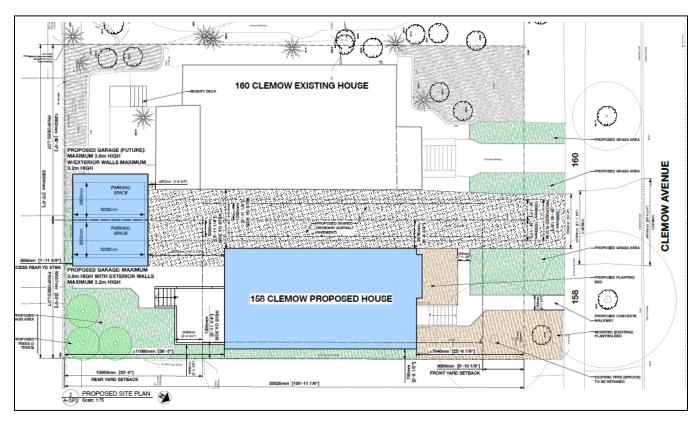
The proposed development site plan. The proposed house and parking spaces are shown in blue.
